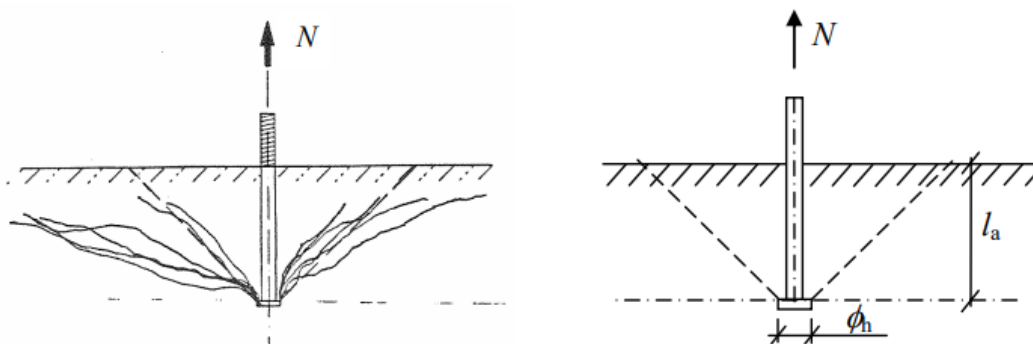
Schematic representation of concrete cone failure (du Béton, 2008)
